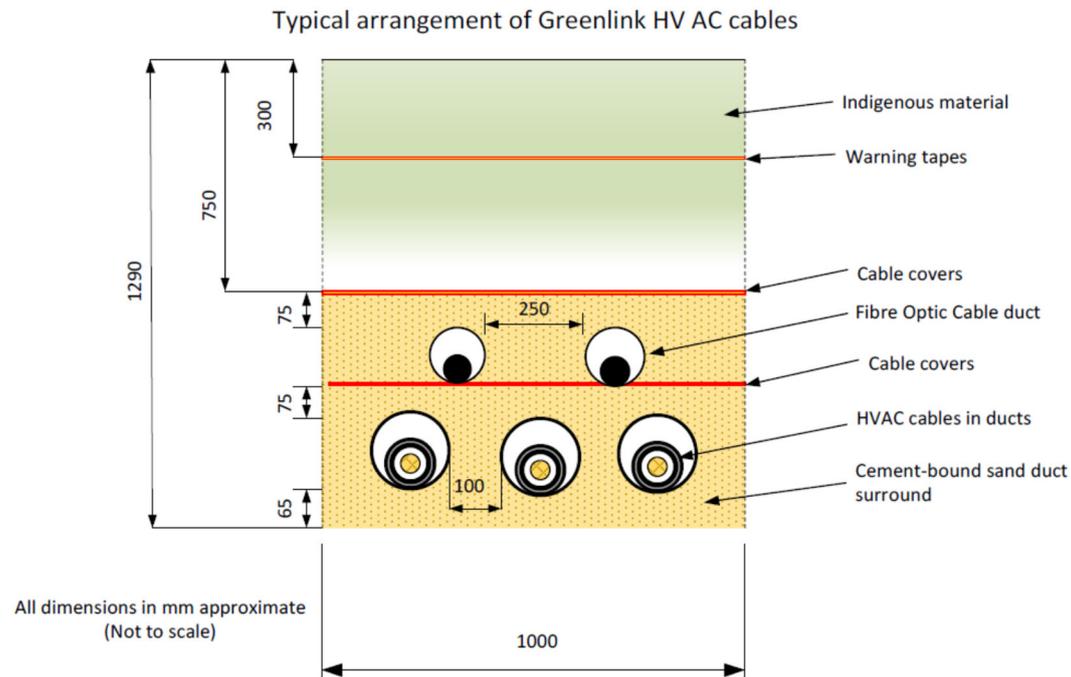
Typical HVAC Trench Cross-Section (source: WSP | not to scale)
